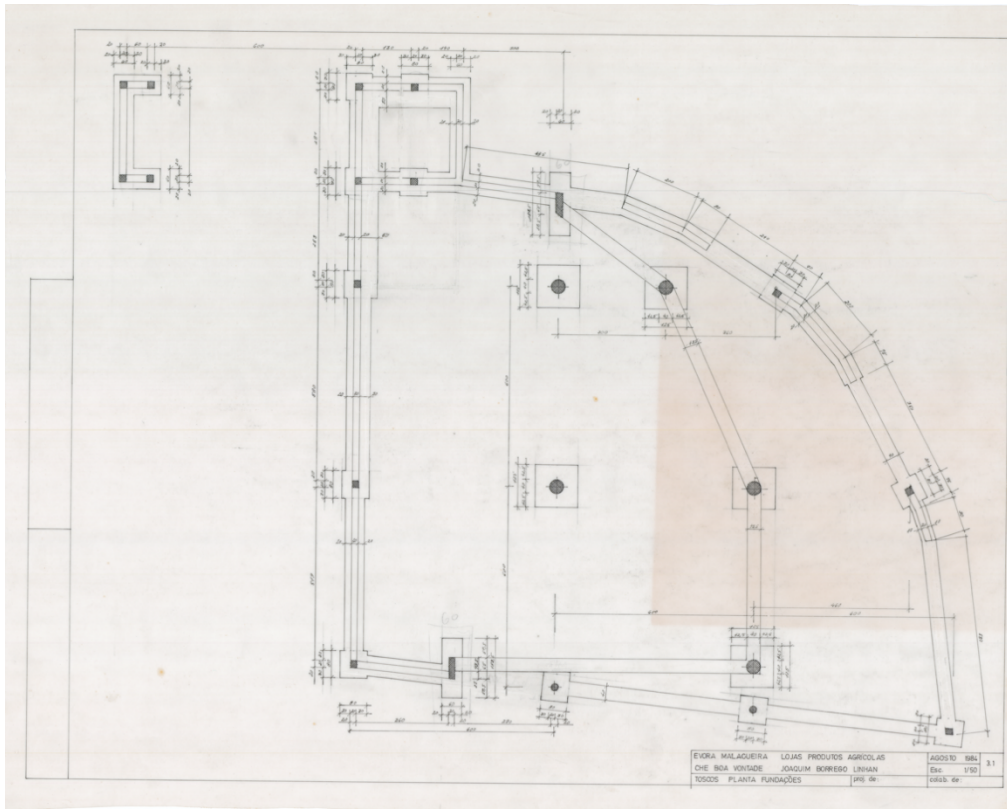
Foundation plan, organic market. By: Drawing Matter.
